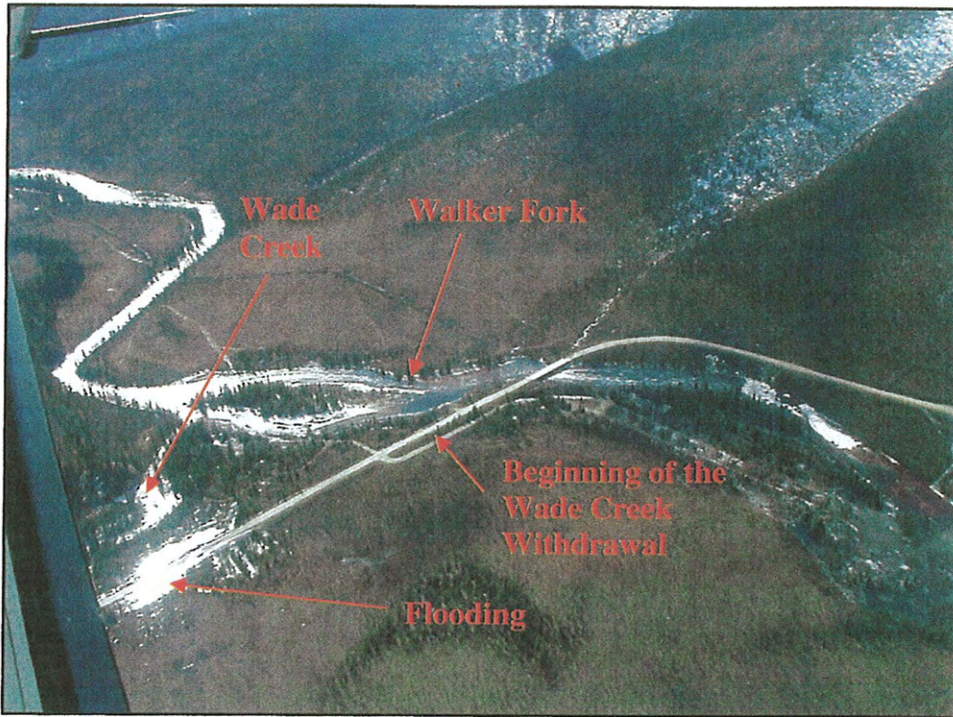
Aerial view of flooding along the Taylor Highway near the Walker Fork Campground. (4/30/03)
